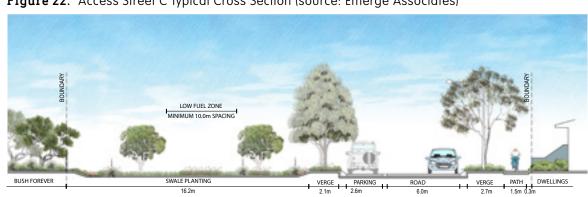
Access Street C Typical Cross Section (source: Emerge Associates)
